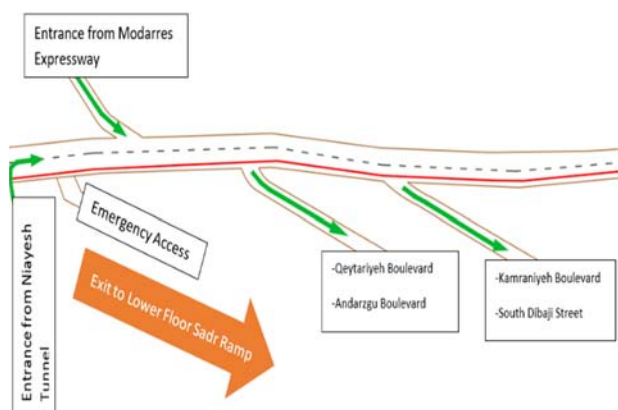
Access ramps of west to east direction to Sadr Overpass
